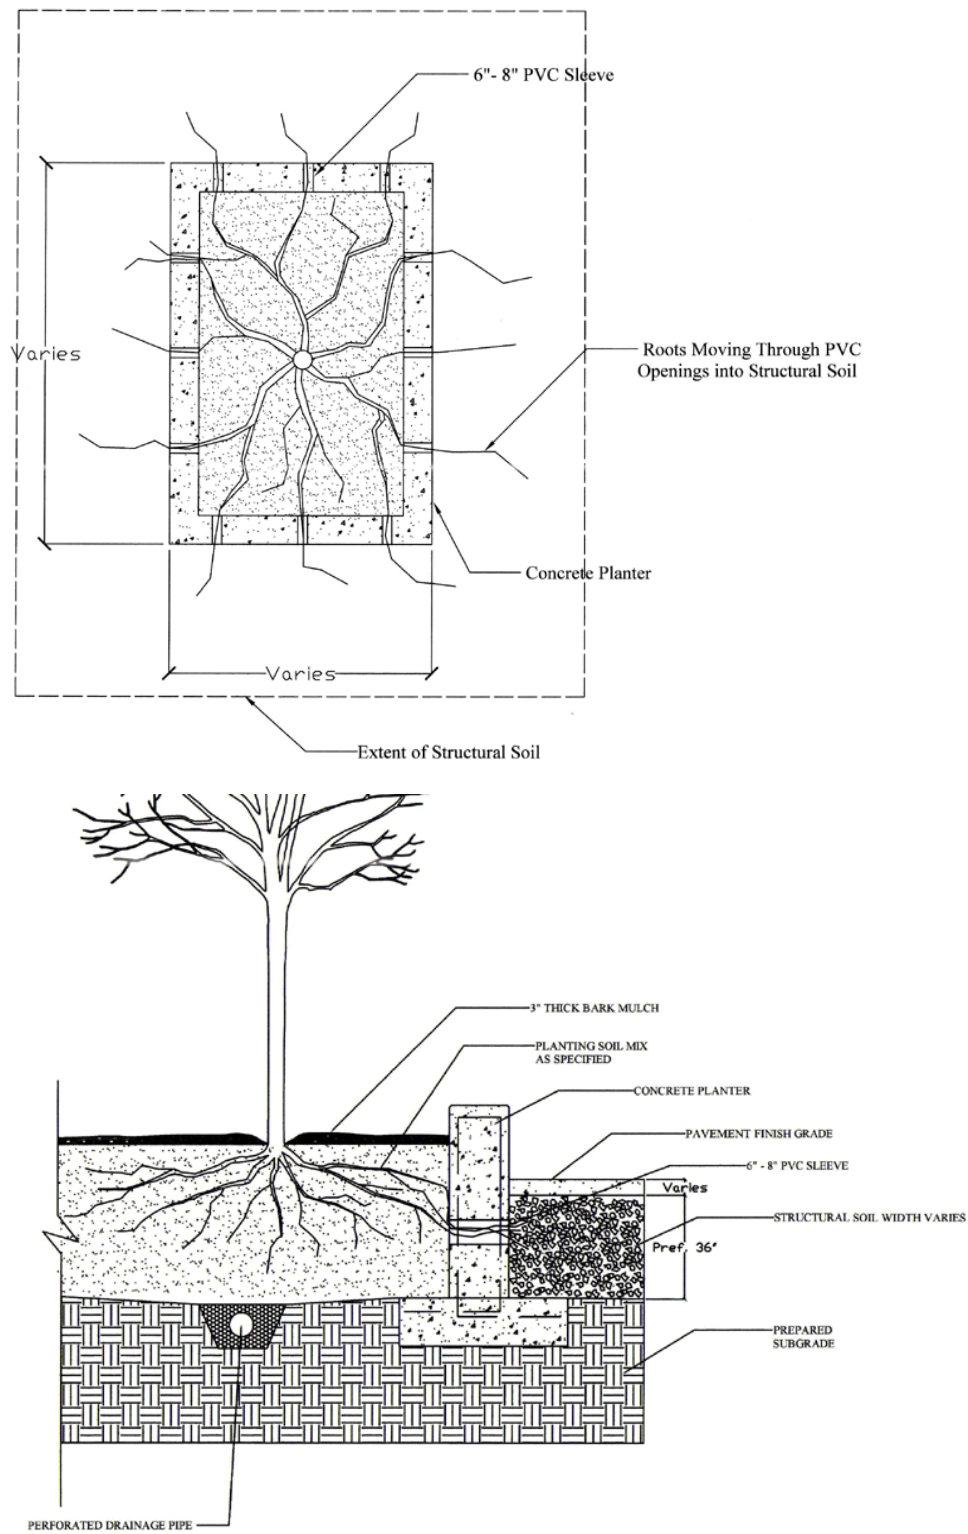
Roots move through PVC openings in concrete planter box wall into structural soil under pavement (Urban Horticulture Institute 2007).
